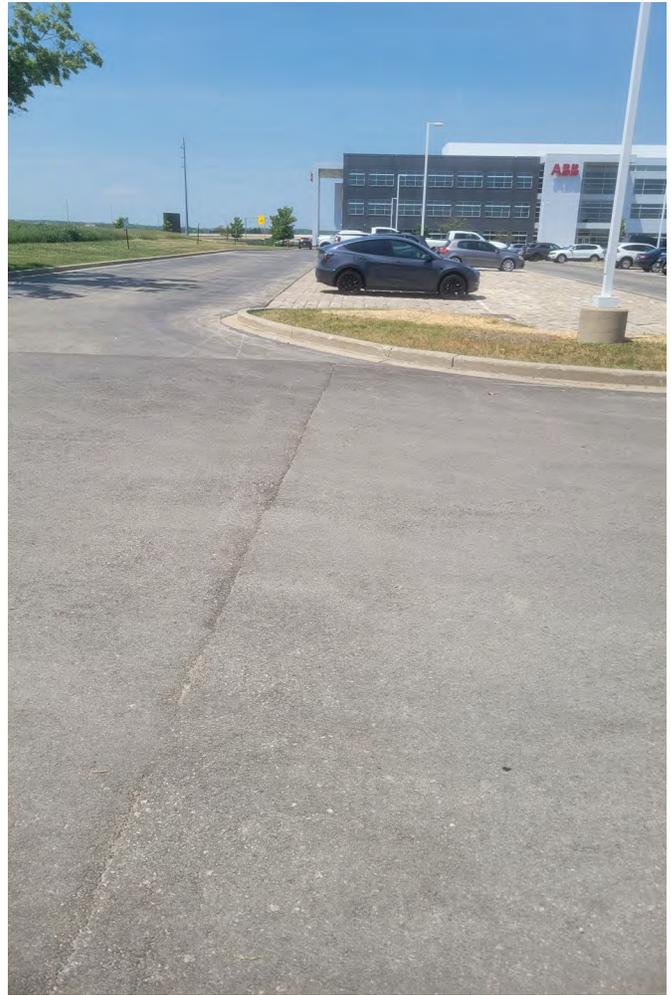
Asphalt paved parking lot within southeastern portion of Lot 3 (east of ABB building). Permeable pavers along parking rows of ABB parking lot. Mulched and vegetated topsoil cover within greenspace islands (limited use). View to west; photograph taken on June 1, 2023.
